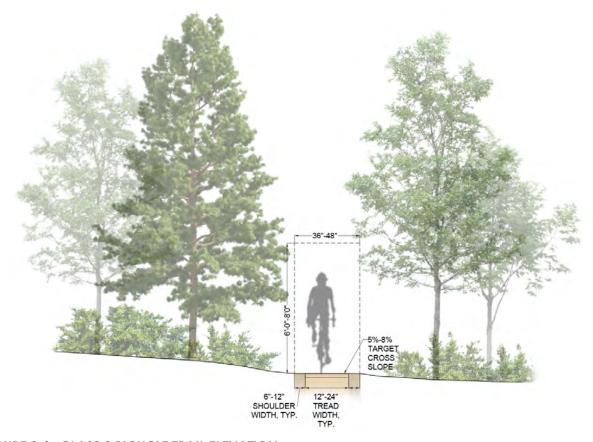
CLASS 2 BICYCLE TRAIL ELEVATION
